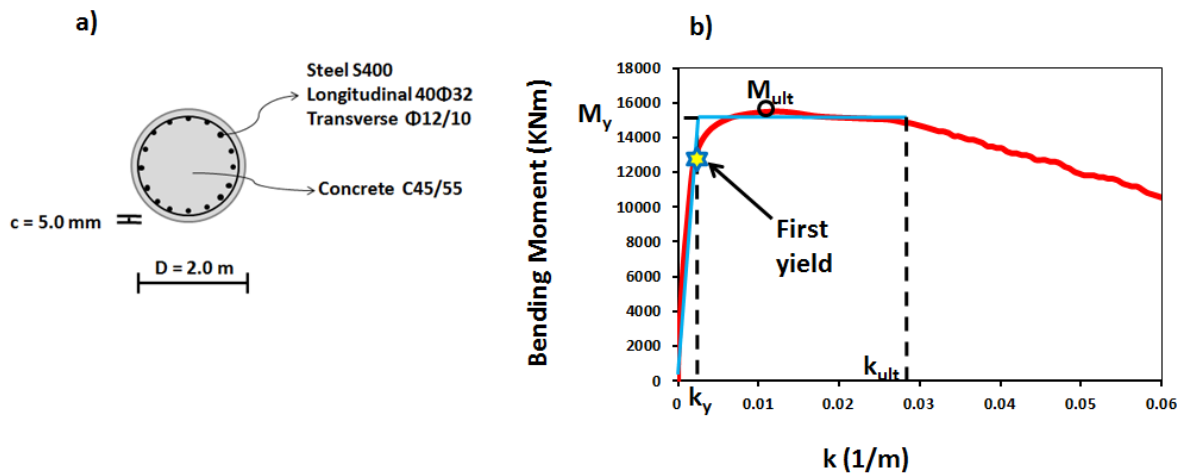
(a) Geometry and reinforcement of the reinforced concrete sections (b) moment – curvature relationship at the pier base.
